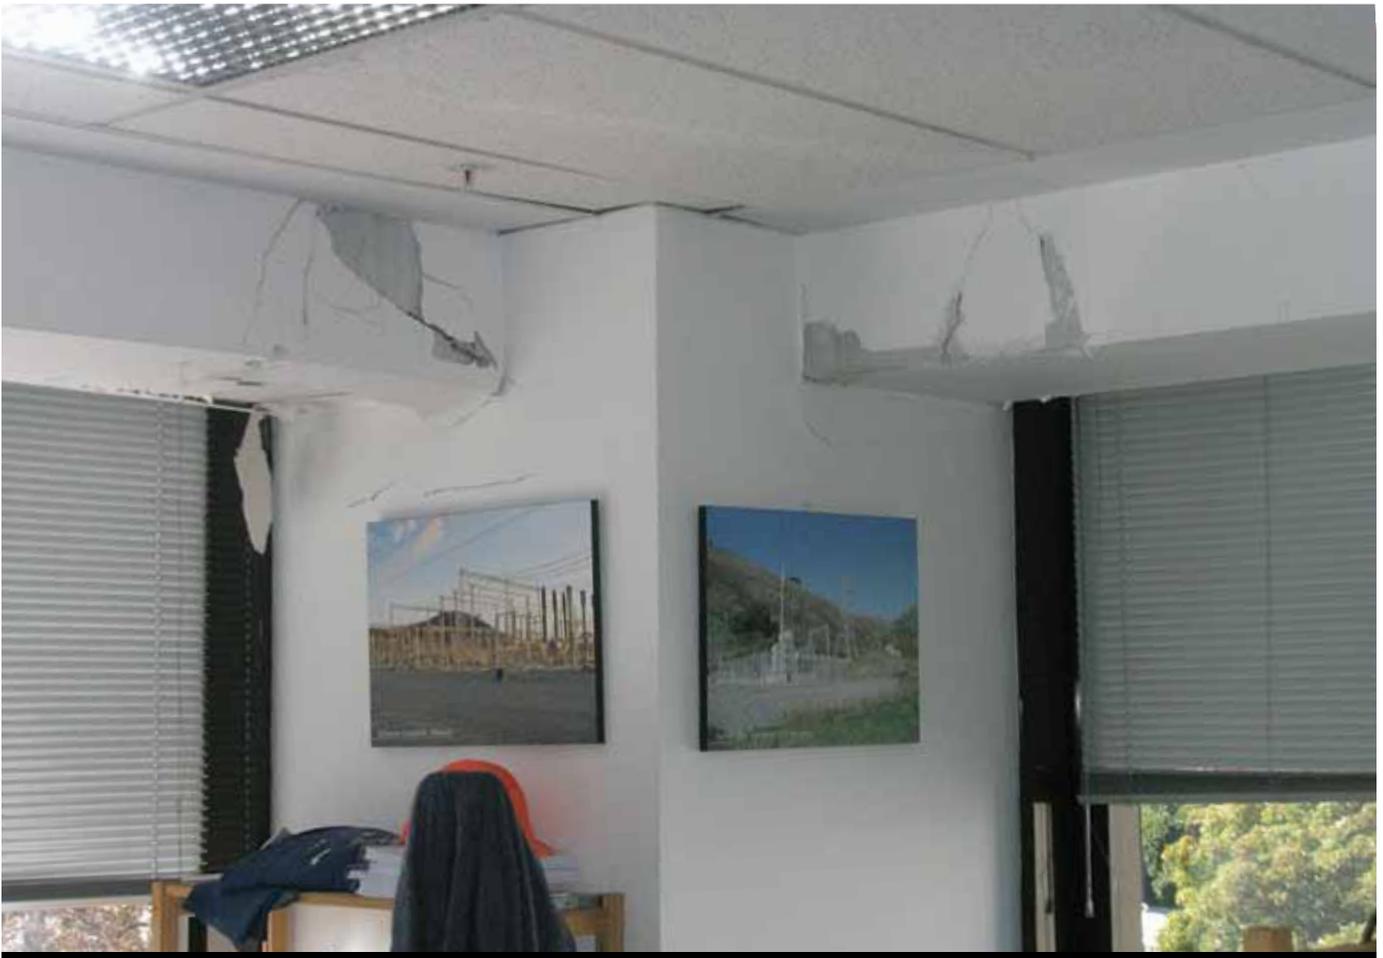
Corner joint in upper floor indicated damage suffered in February 22, 2011, earthquake in New Zealand. The north-south beam (upper left) exhibits flexural-torsional cracks, while the east-west beam (upper right) exhibits flexure cracks.
